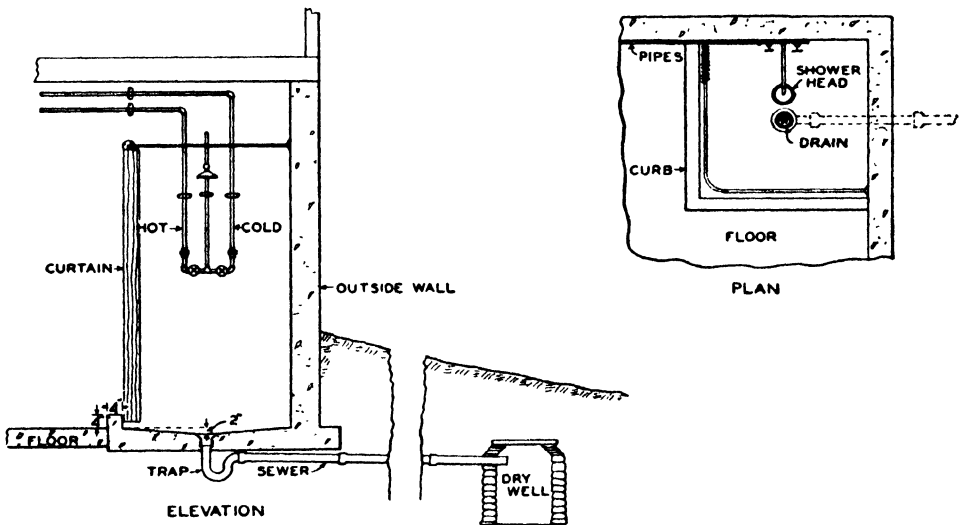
Elevation and plan of a relatively inexpensive shower bath for the basement or barn.
